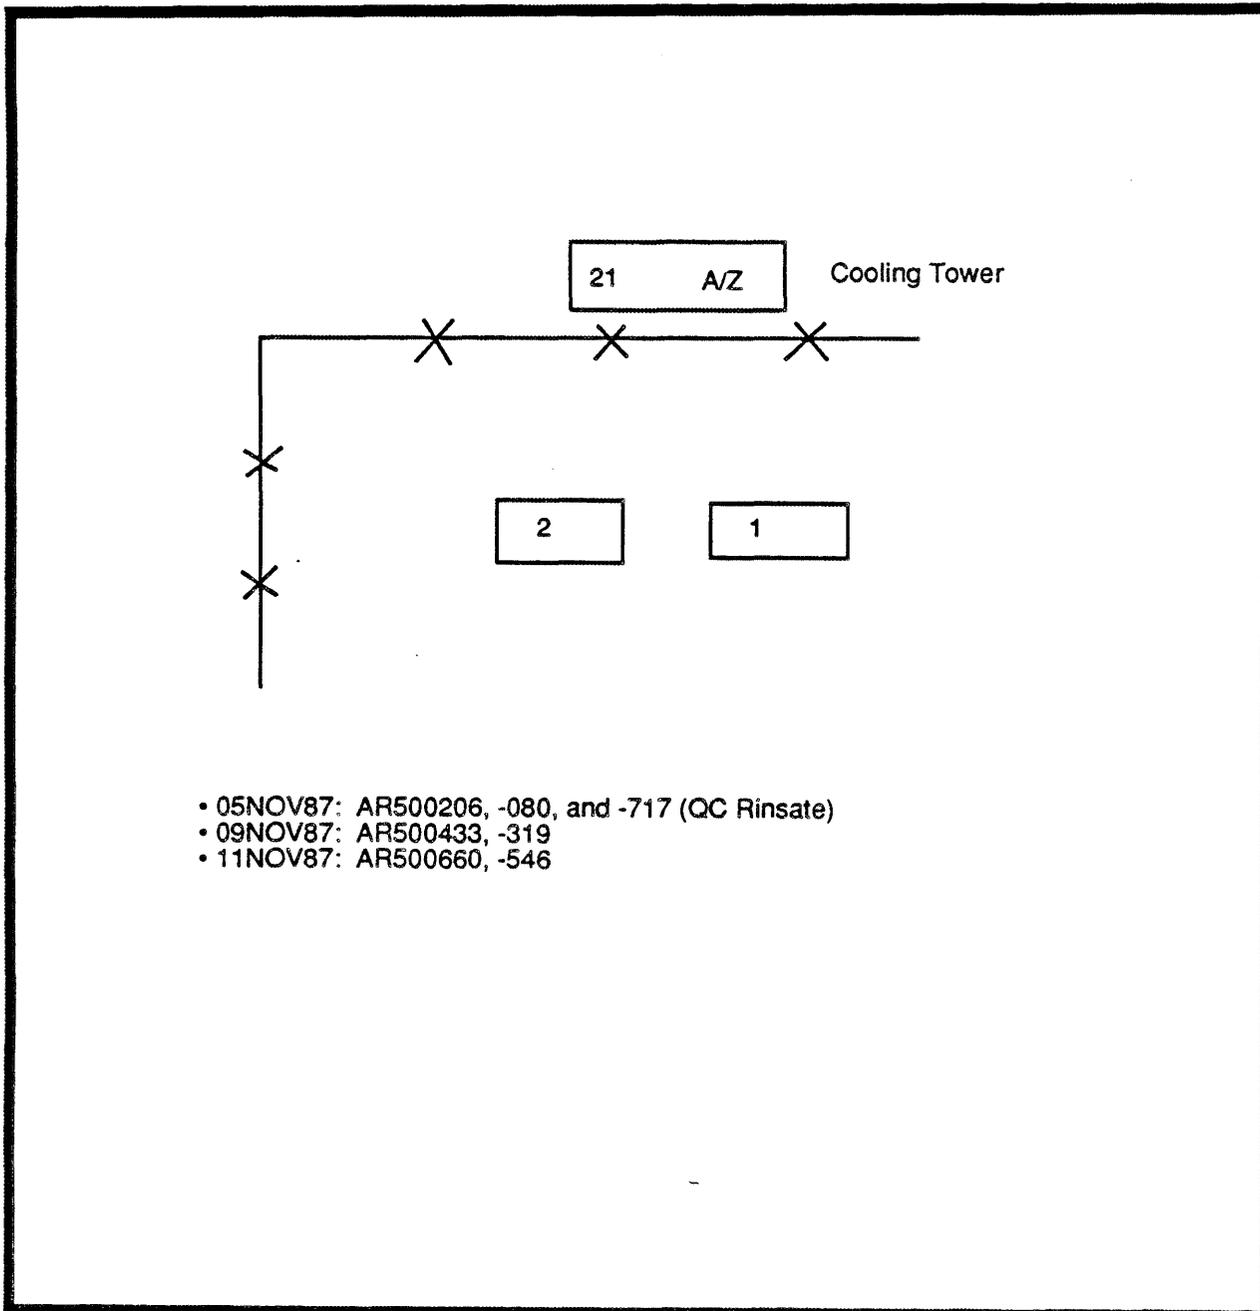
Building 203 Retention Tanks Off Central Corridor
